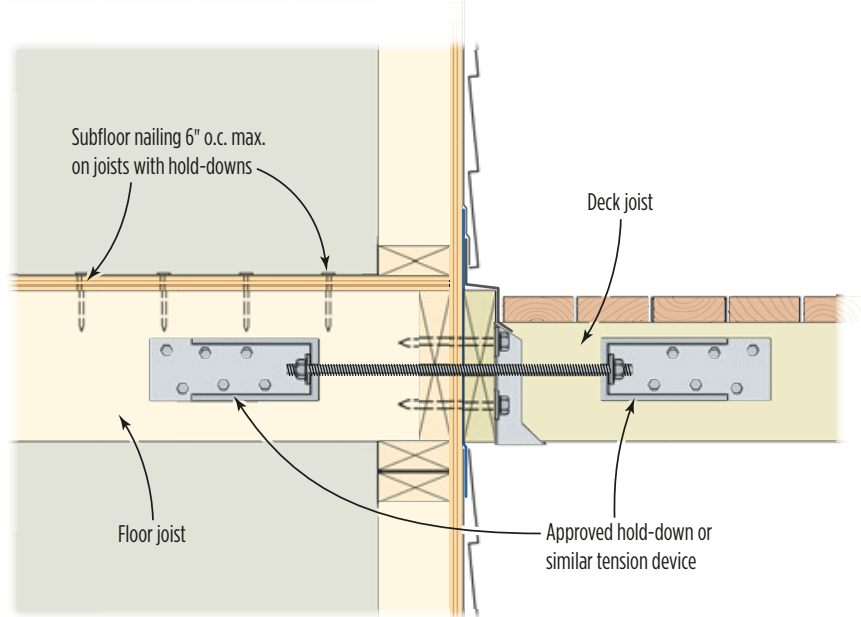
A new controversial anchor detail is now “permitted” — though not explicitly required — under the 2009 IRC, and has raised inspectors’ awareness of lateral loading issues. From a practical standpoint, installation may be difficult in existing homes because the tight subflooring nailing schedule would likely require ripping up the finish flooring.
